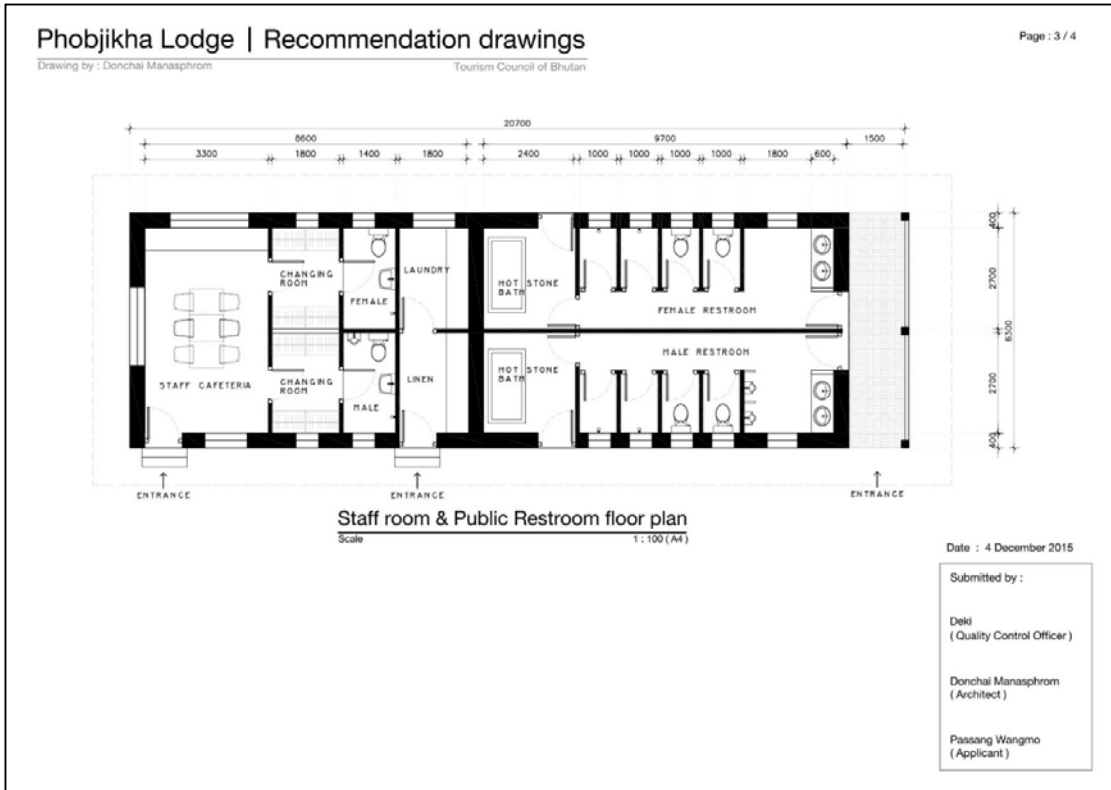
Phobjikha lodge recommendation drawings – Staff quarter floor plan
